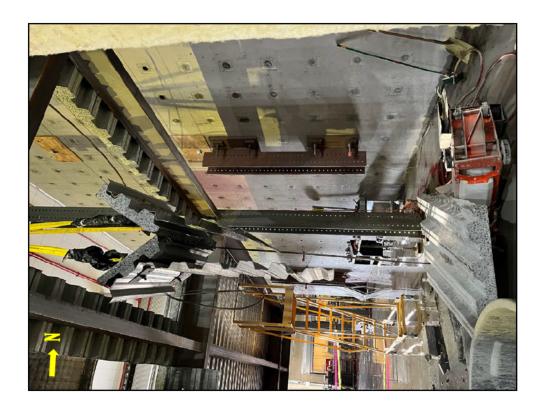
Image of the suspended concrete debris following the incident. The pile of concrete pieces and floor saw are observed directly below the suspended debris, with the rolling stairs in the background. Image was taken looking west.
